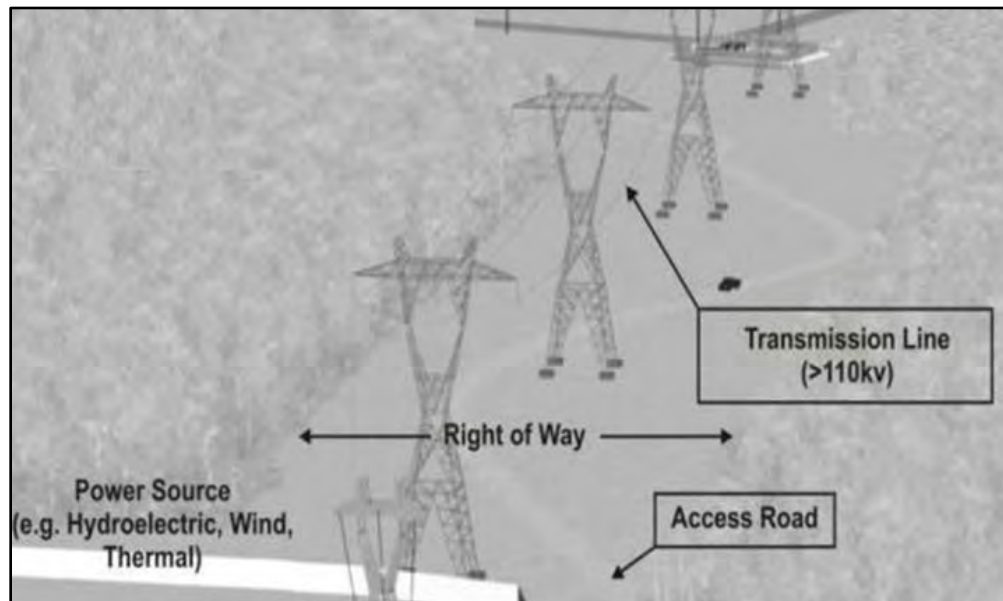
Right of Way and Access Road for OHTL (IFC, 2007)
